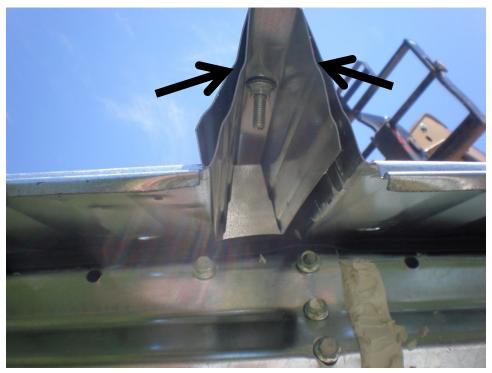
Arrow pointing to the foam block affixed to the rib clip. Sealant was placed around the interior of the entire roof/sidewall interface.
